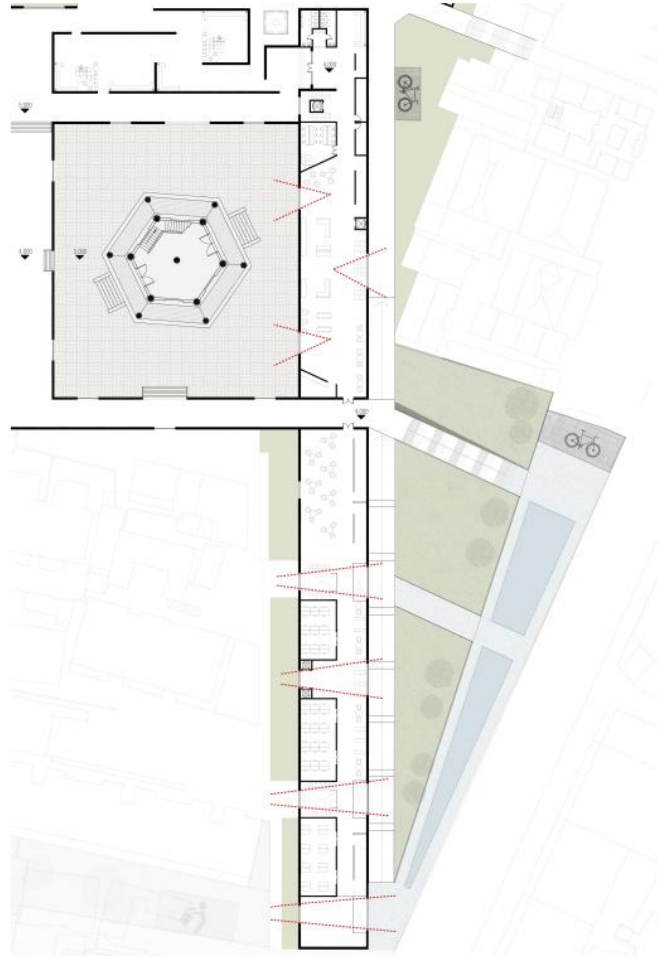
Diagram showing the location of exterior windows (Source: elaborate by author)
